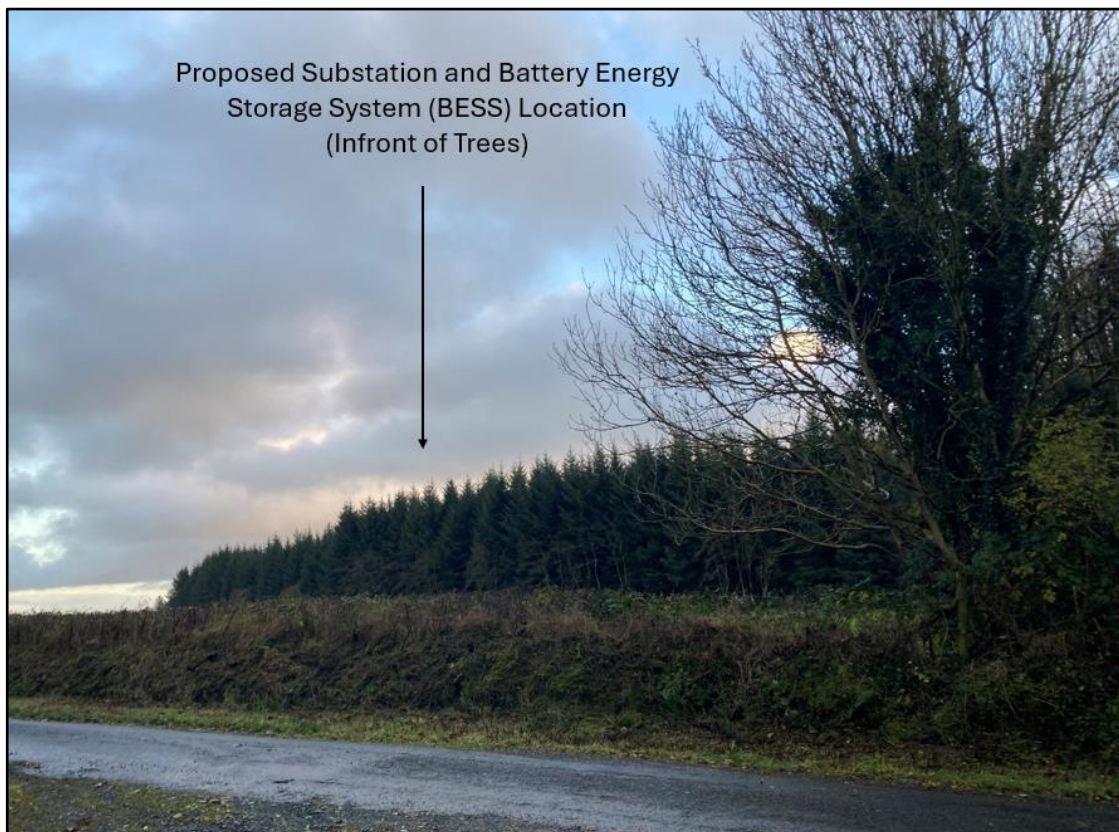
Location of the proposed onsite 38kV substation from the local public road immediately north of the onsite substation
